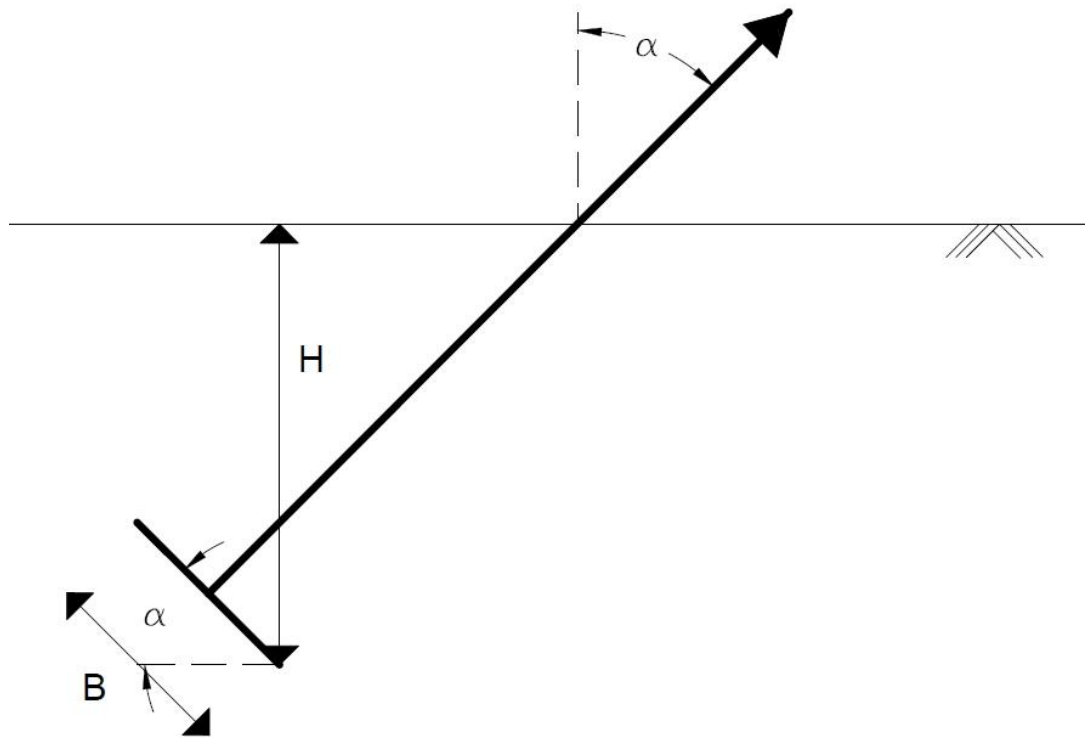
Anchor geometry used (adapted from: Meyerhof (1973))
